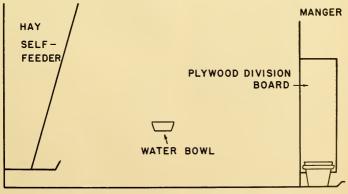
Side view of the calf pen, shown in Fig. 59.
